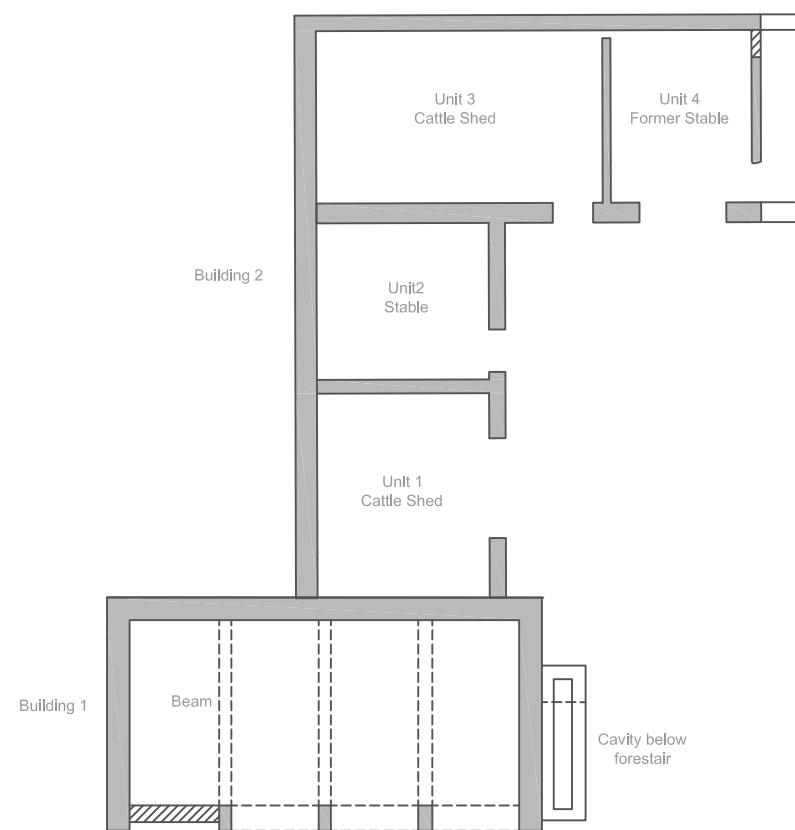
Ground Floor Plan of buildings 1 & 2
